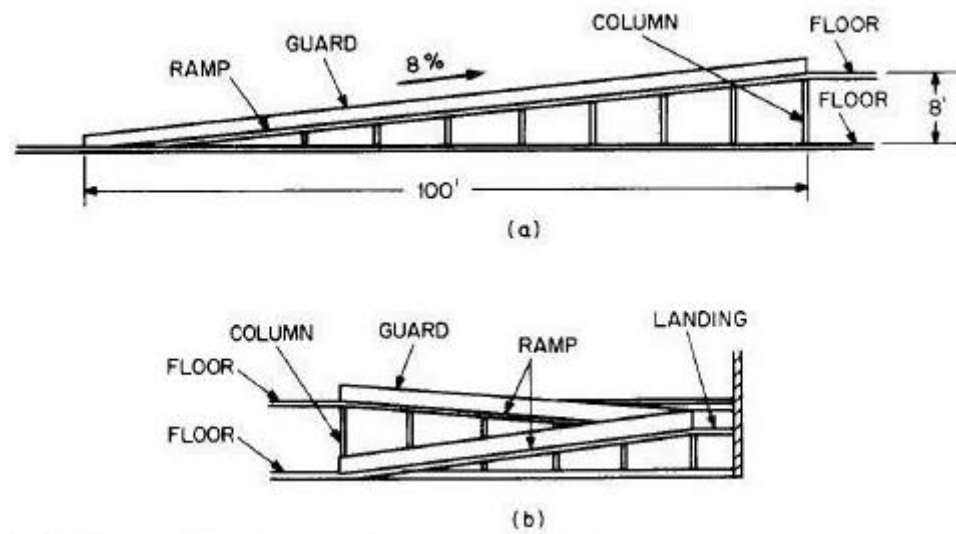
A Ramp (source: [civilengineeringx.com](http://civilengineeringx.com))
